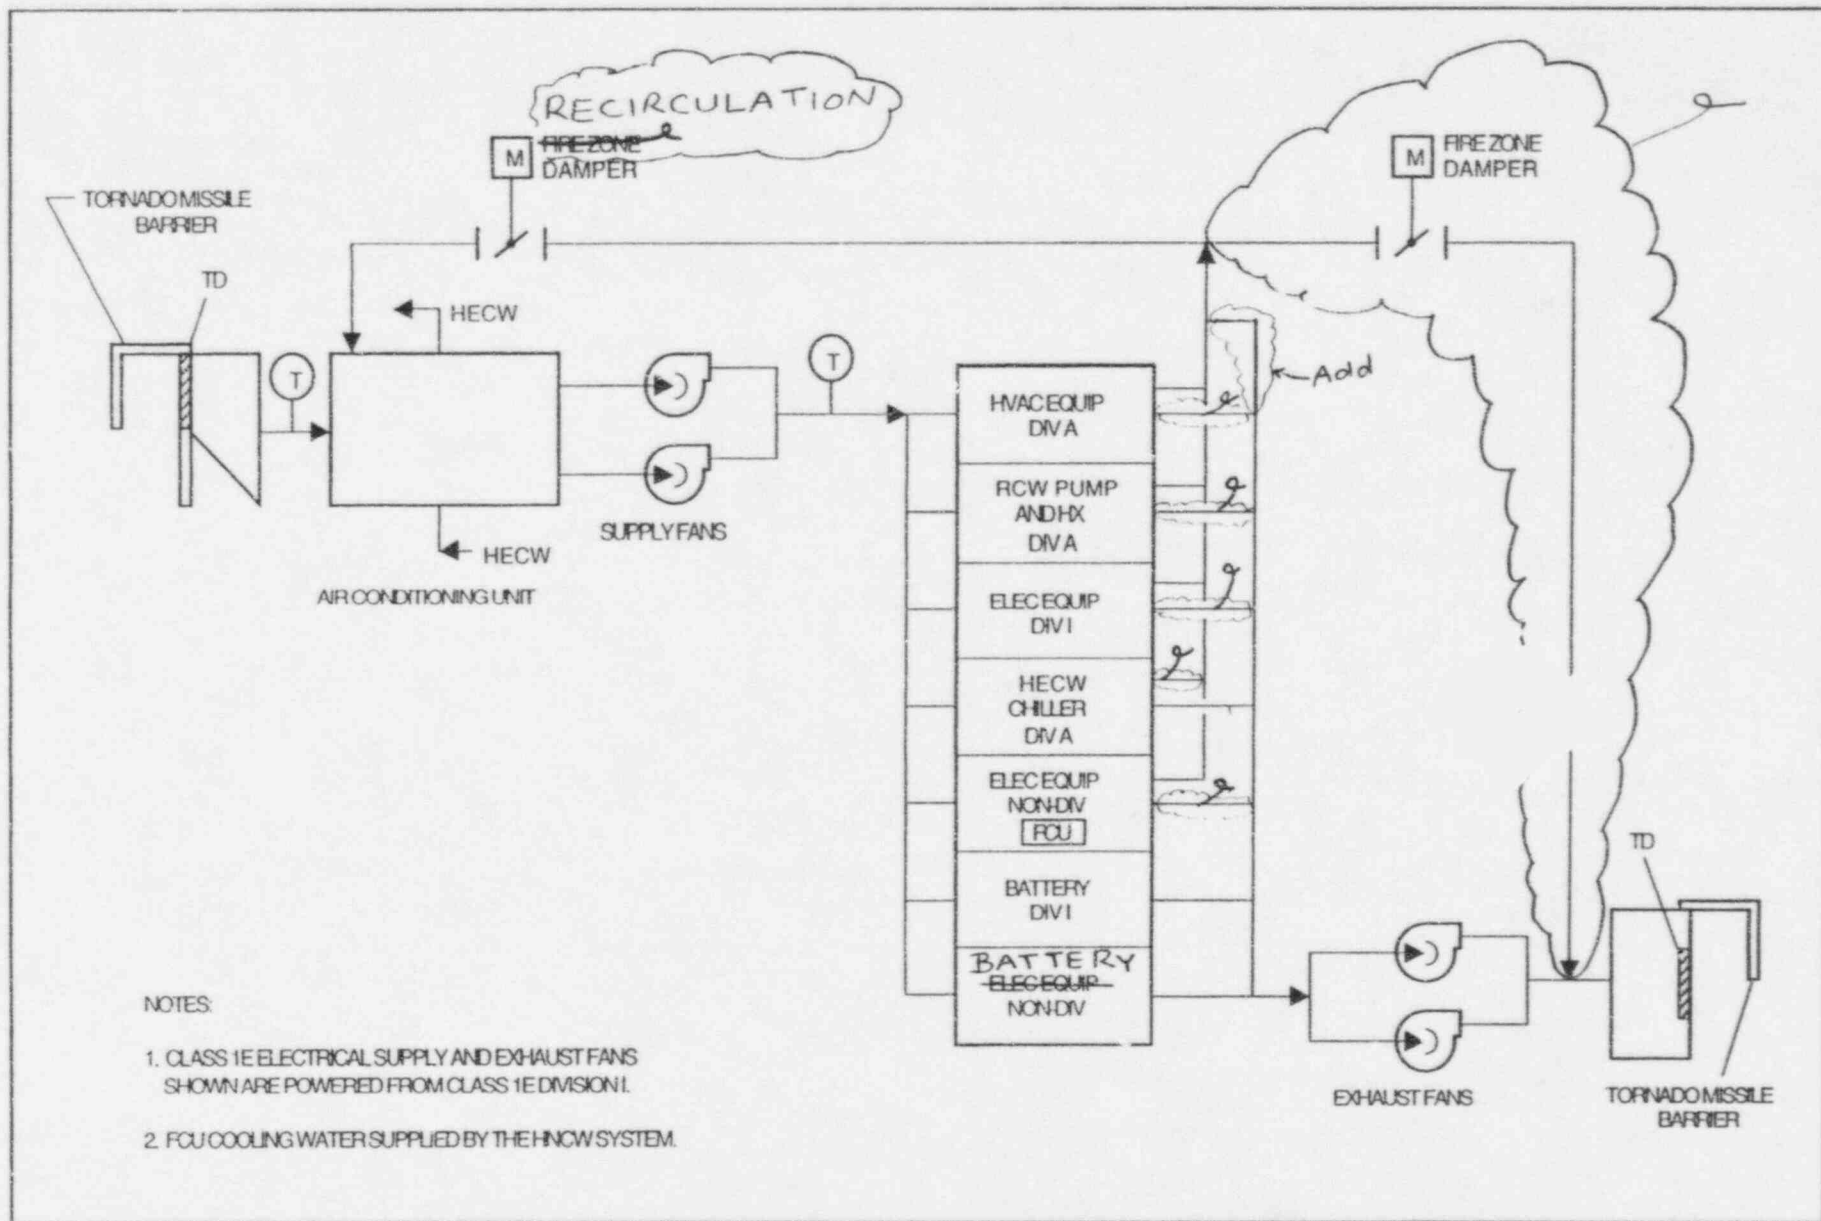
Control Building Safety-Related Equipment Area HVAC System (Division A)
